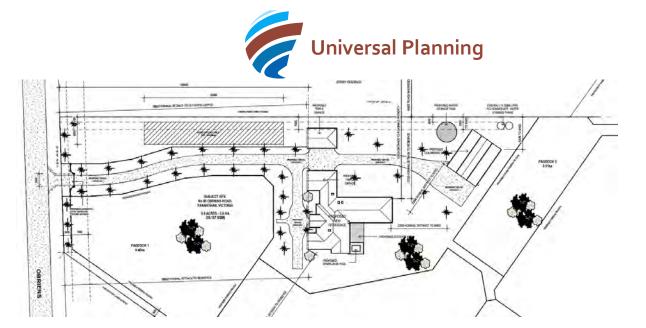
Site Plan (source: BB Design and Documentation, Proposed Site Plan).
